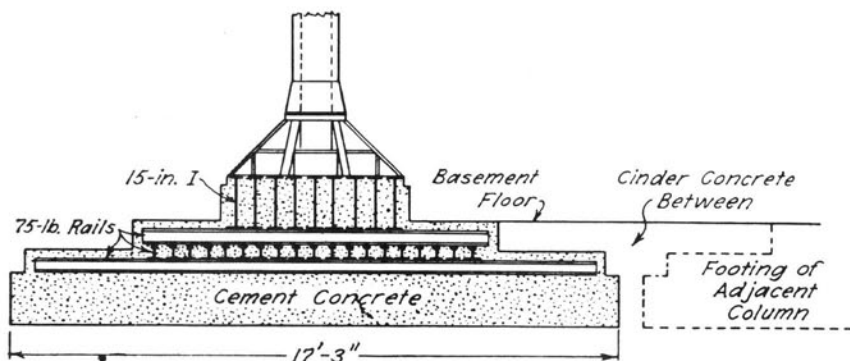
SECTION THROUGH RAIL AND I-BEAM GRILLAGE OF THE FAIR STORE
